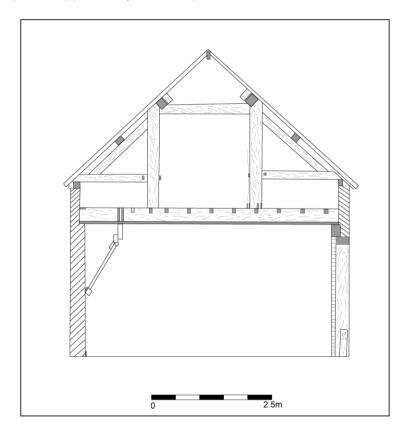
W-facing section showing queen-post roof trusses in Barn 5
